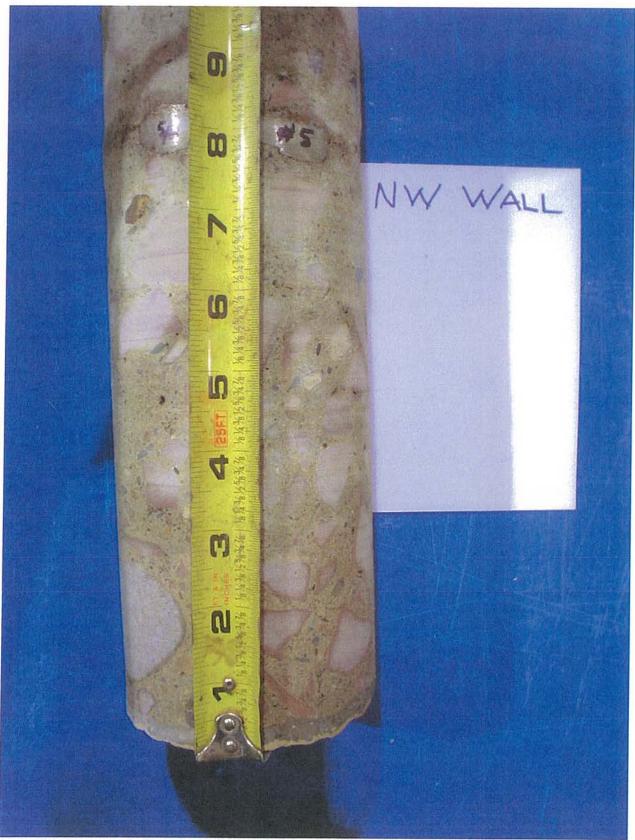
Core sample from the northwest wall showing 1/2 inch reinforcement bar
